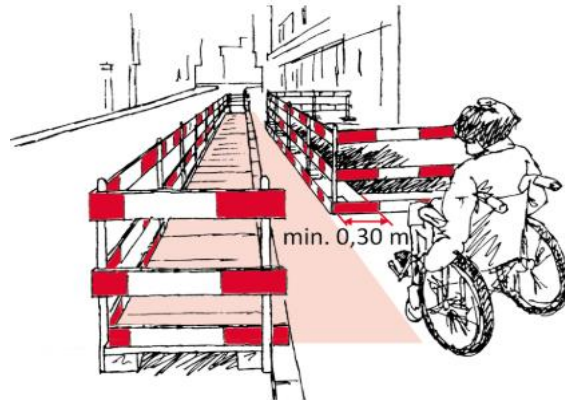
Securing of the construction site with a minimum distance of 0.30m between barriers and excavation (Schmidt and Manser, 2003).
